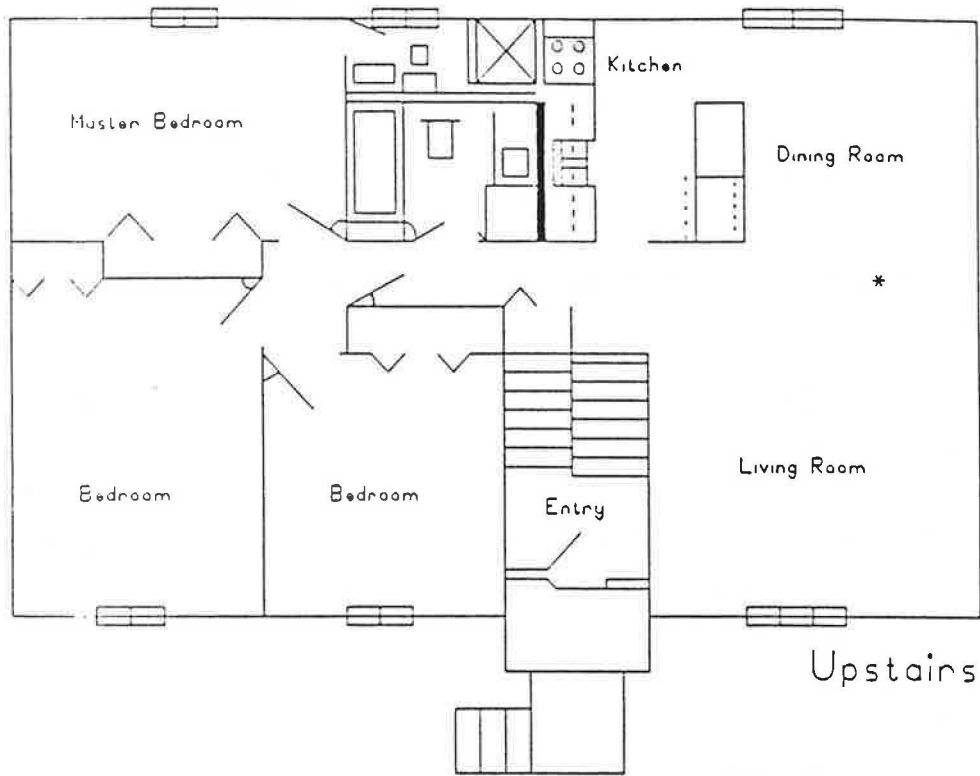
Floor Plan of the GEOMET Research Houses (asterisk denotes sampling location in each zone)
